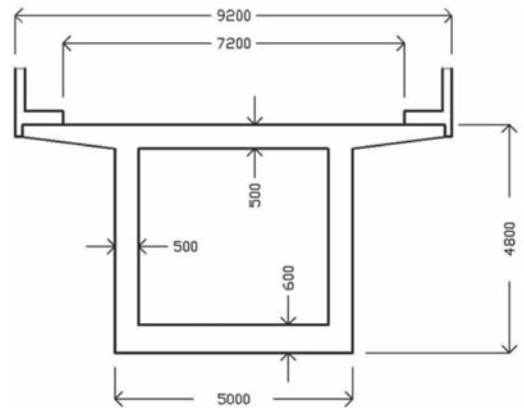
A typical cross section of deck slab (all dimensions are in mm).
